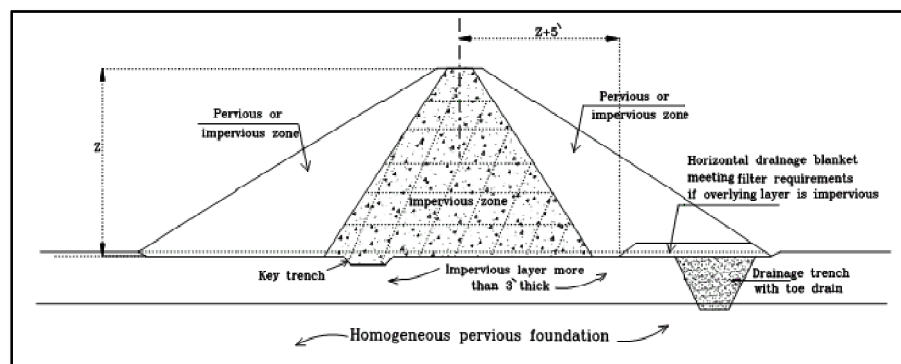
General Arrangement of Zone Embankment (Picture Courtesy : Internet)
